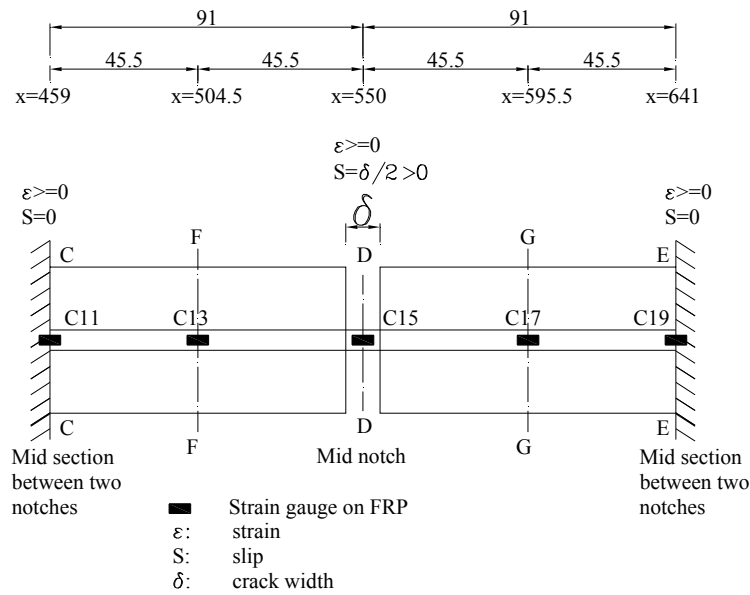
Enlarged view between section C-C and E-E of the bond test specimens (refer to Figure 3)
